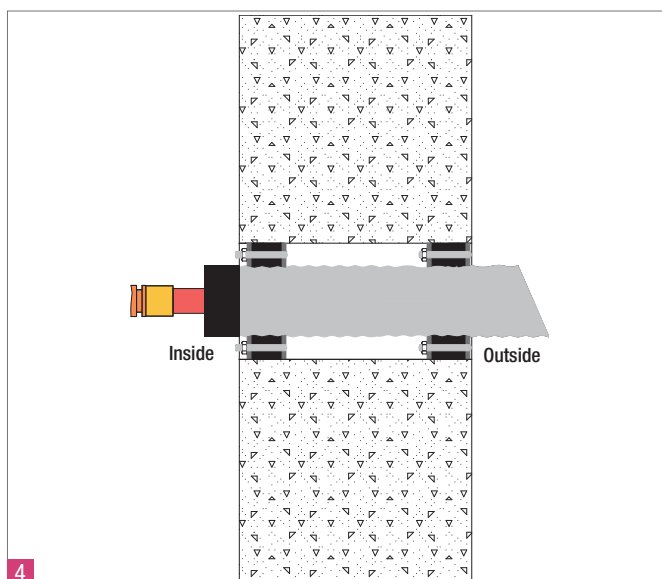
Compression wall seal FA 40, water not under pressure, side view
